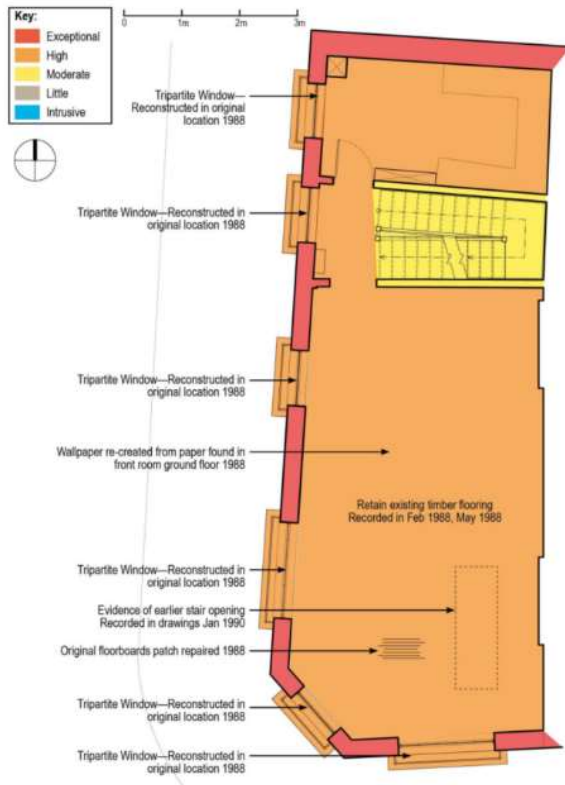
Plan of first floor showing gradings of significance and noting reconstructed and modified building fabric. Source: GML, 2017)
